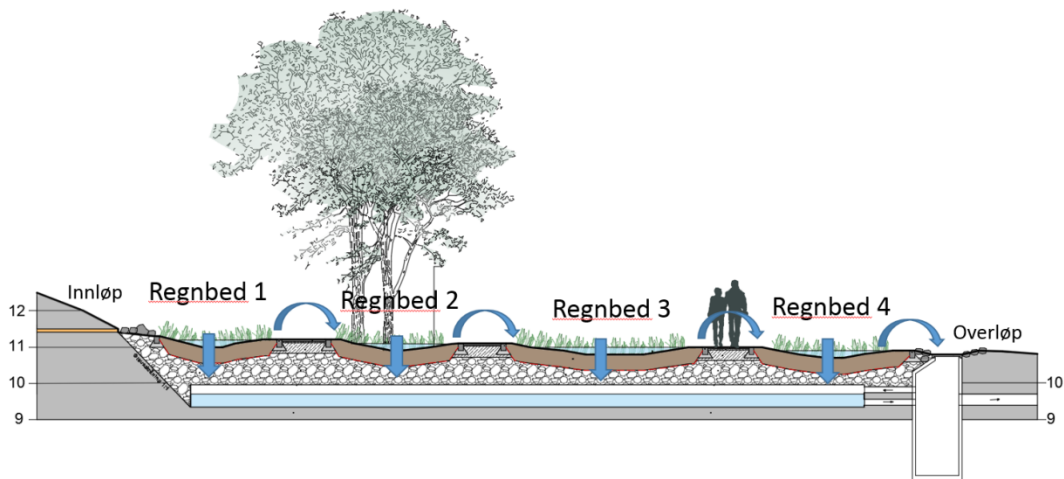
Concept sketch of Bolstadhagen raingarden. Connection between Inlet, raingarden 1, raingarden 2, raingarden 3, raingarden 4, outlet and Q-bic storage. Depth of raingarden is shown in m.a.s.l. (Stener Sørensen, MINA fagrappport 68).
